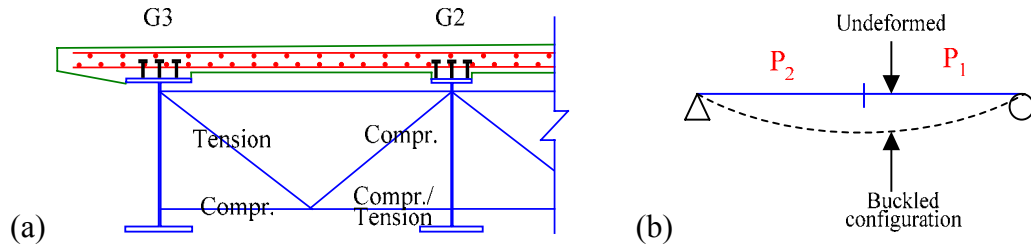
(a) Elevation view of the midspan cross-frame attached to the outside girder, G3, with possible force states (tension/compression) for the factored member forces and (b) schematic treatment of the bottom chord as a simply-supported column subjected to two axial forces along the length.
